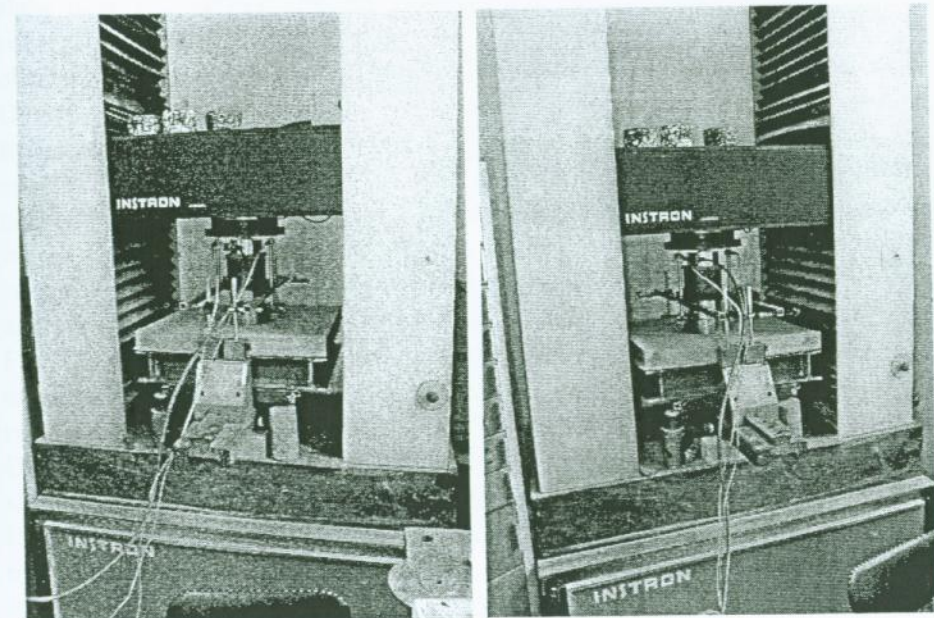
Testing machine and test set-up for bending of steel fibre reinforced concrete slabs
